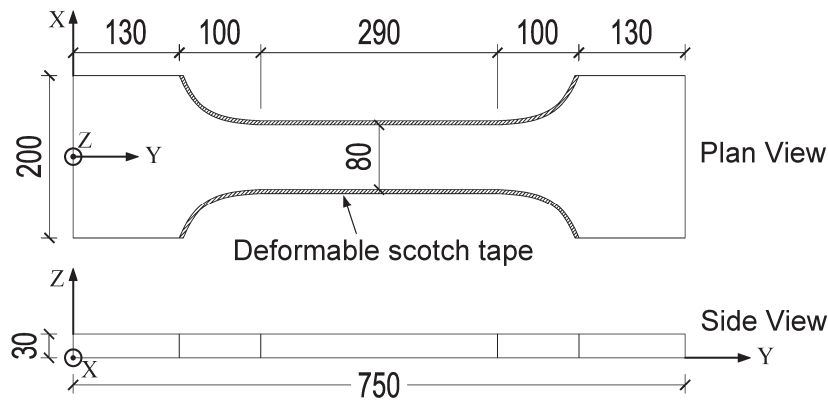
\_ Dumbbell specimen geometry (dimensions in mm)
